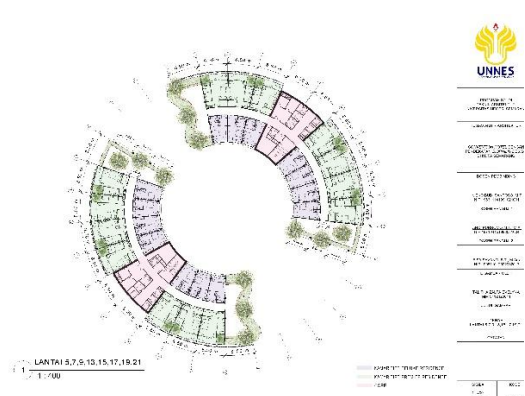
5th, 7th, 9th, 11th, 13th, 15th, 17th, 19th, 21th Floor Plans
